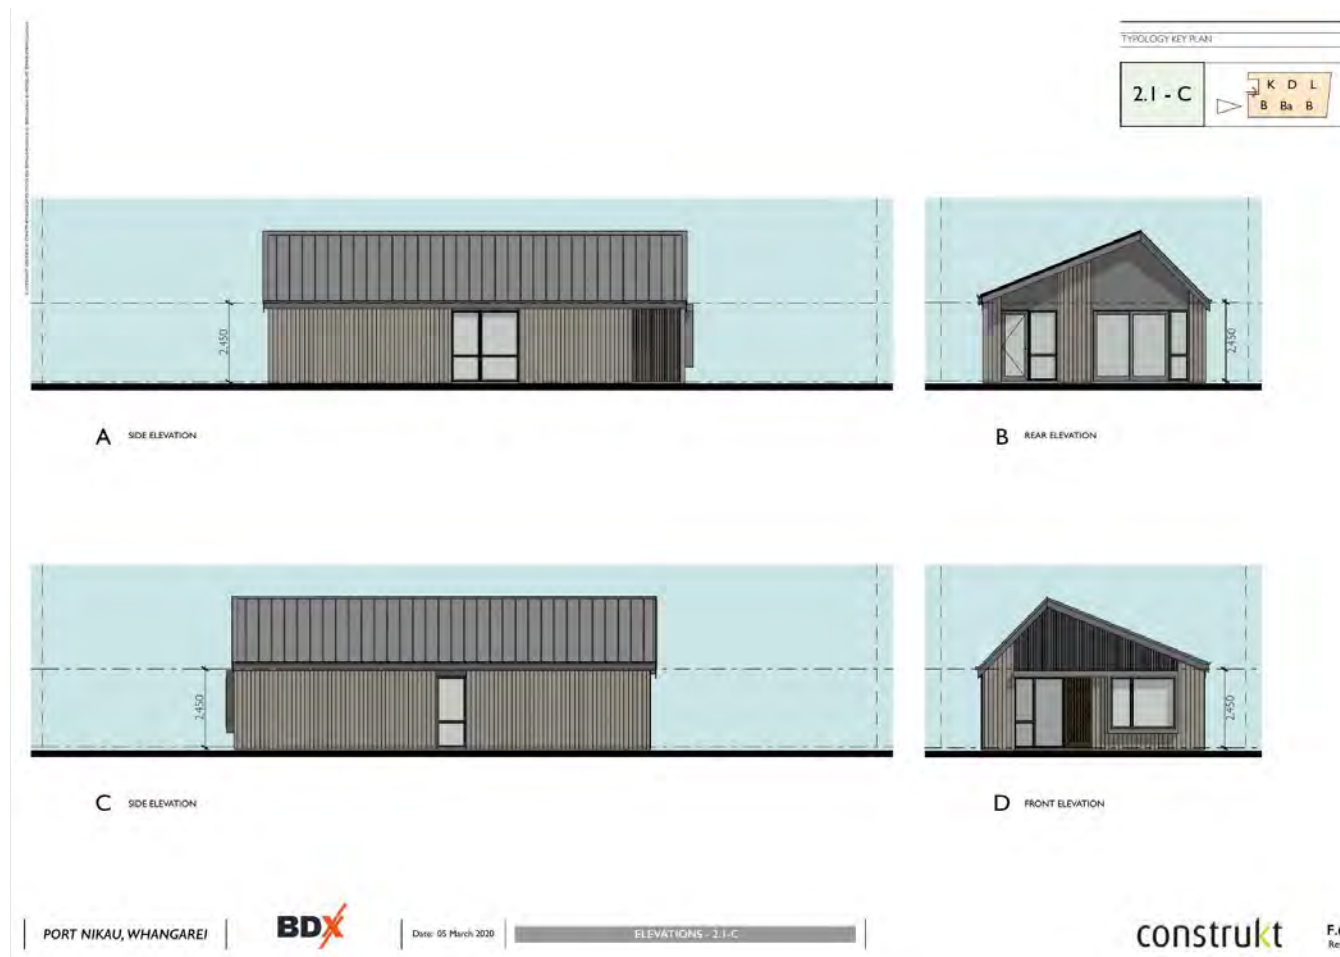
PDNA 1. Part F – Typology Plans and Elevations
